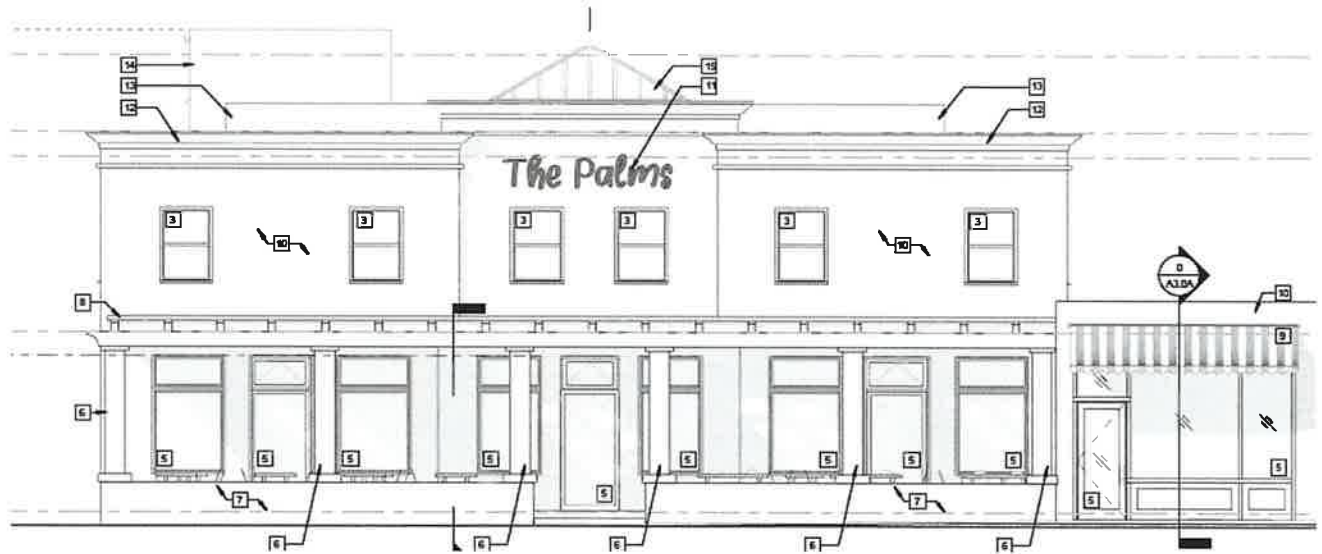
, Proposed Signage on the Street Façade facing Linden Avenue
